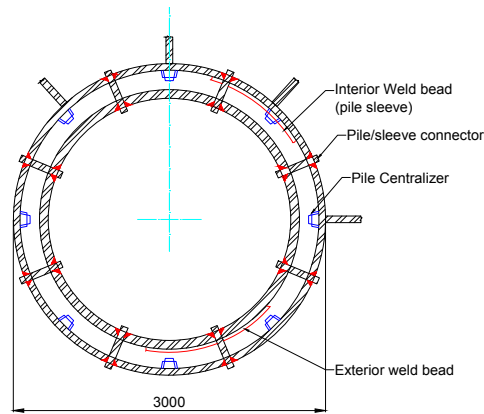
Cross Section of East piles inside Pile cap [Ref.: AutoCAD made by the author].
